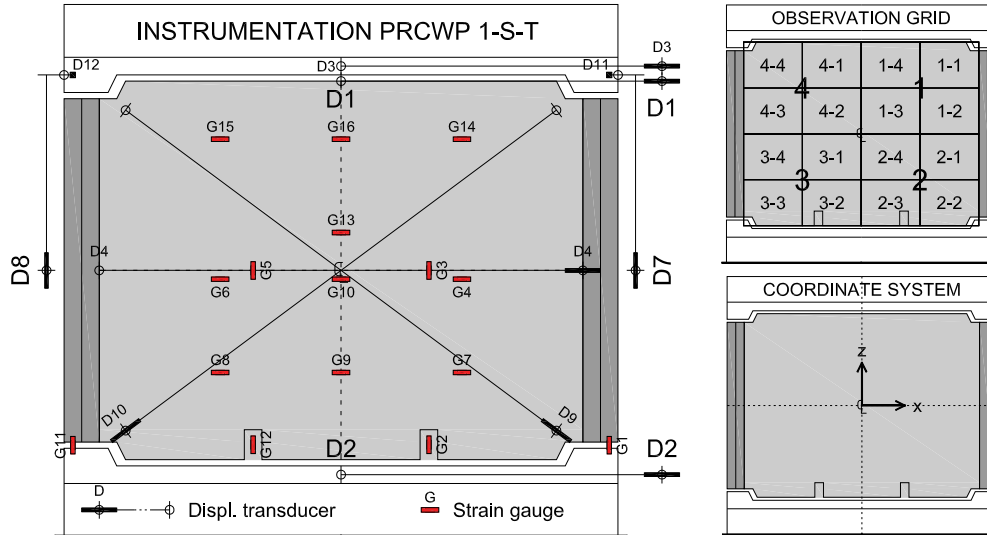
Instrumentation layout of specimen PRCWP 1-S-T
